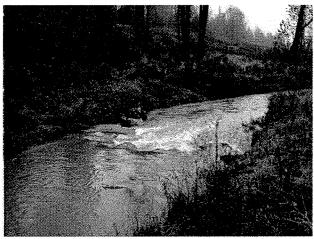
Looking downstream from MS Station 58+75 at Station 58+44 rock J vane. (9/27/04)
